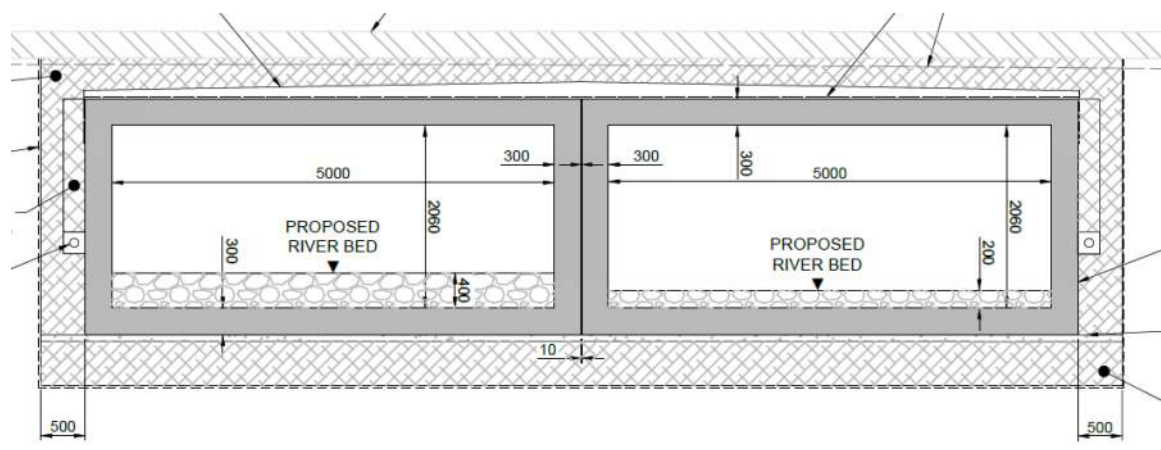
Cross-section of proposed double box culverts at Brooklodge
